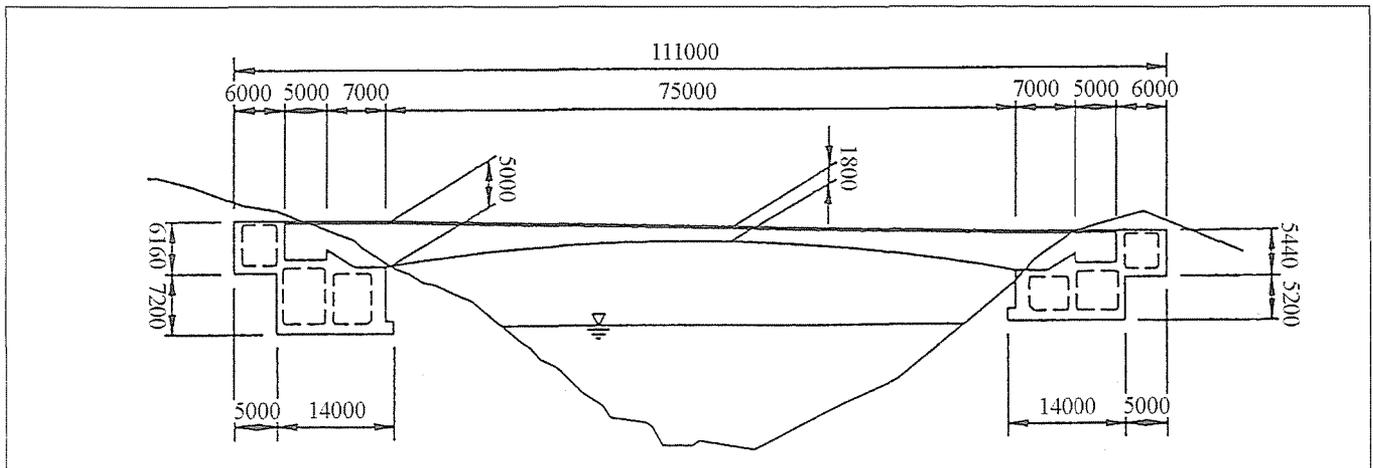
Bridge at Haramachi power plant, Japan (FRP International, 1997)
